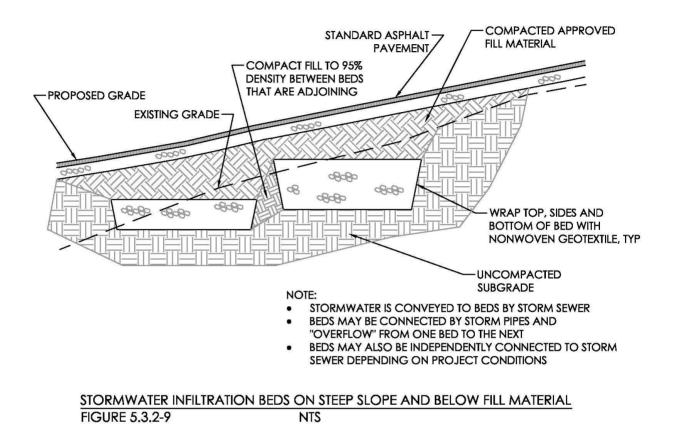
Cross-section of infiltration beds on slope and beneath fill material.
